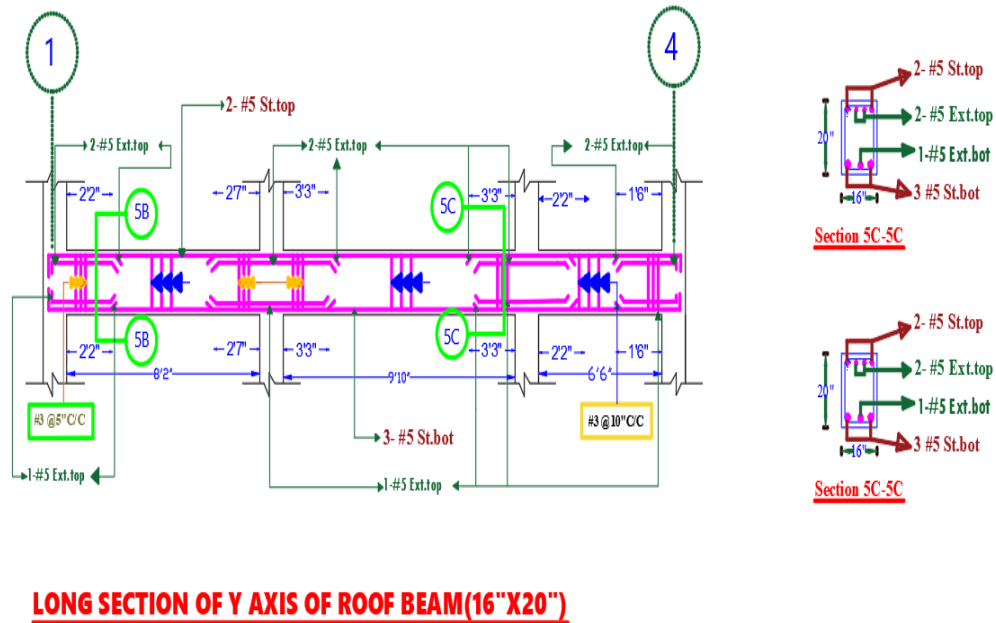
Reinforcement Area of Roof (Y-Axis)
